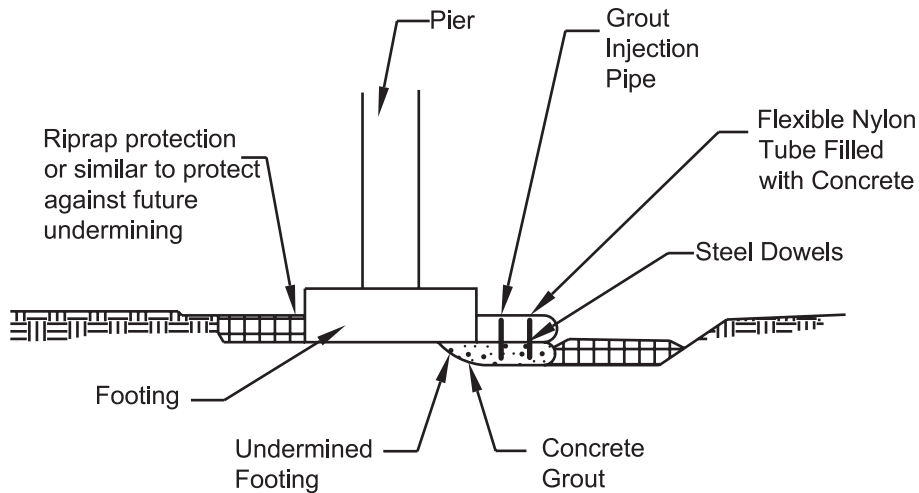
Structural repairs, grouting with pipe injection of concrete.
